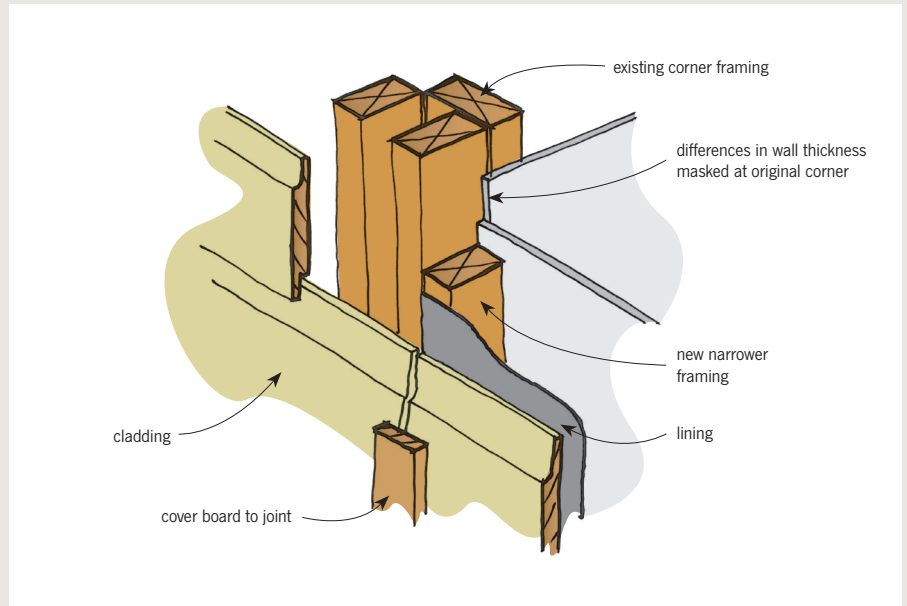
Detail to mask differences in wall thicknesses at the corner with new narrower framing.
